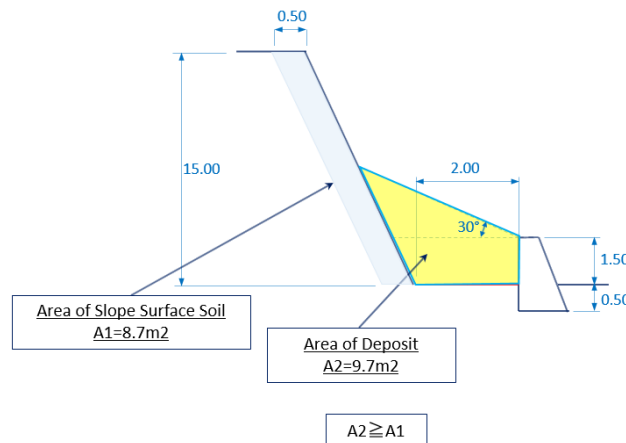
Calculation of Pocket Width of Retaining Wall
